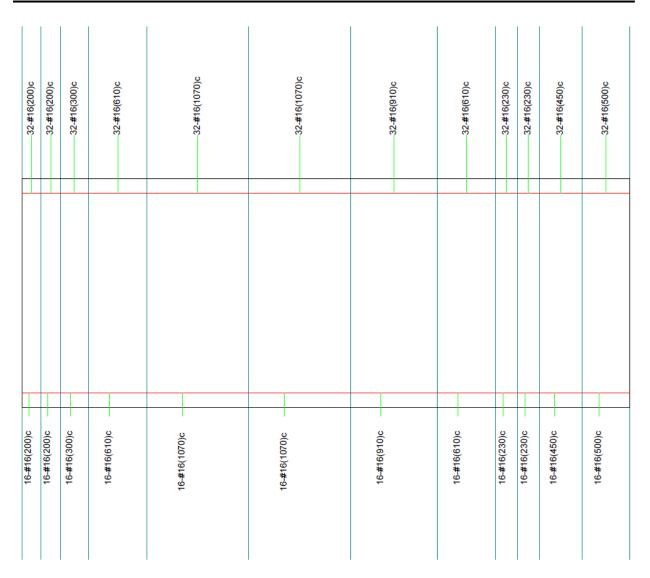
As Detailed Flexural Reinforcement – Investigation Mode (spBeam)
